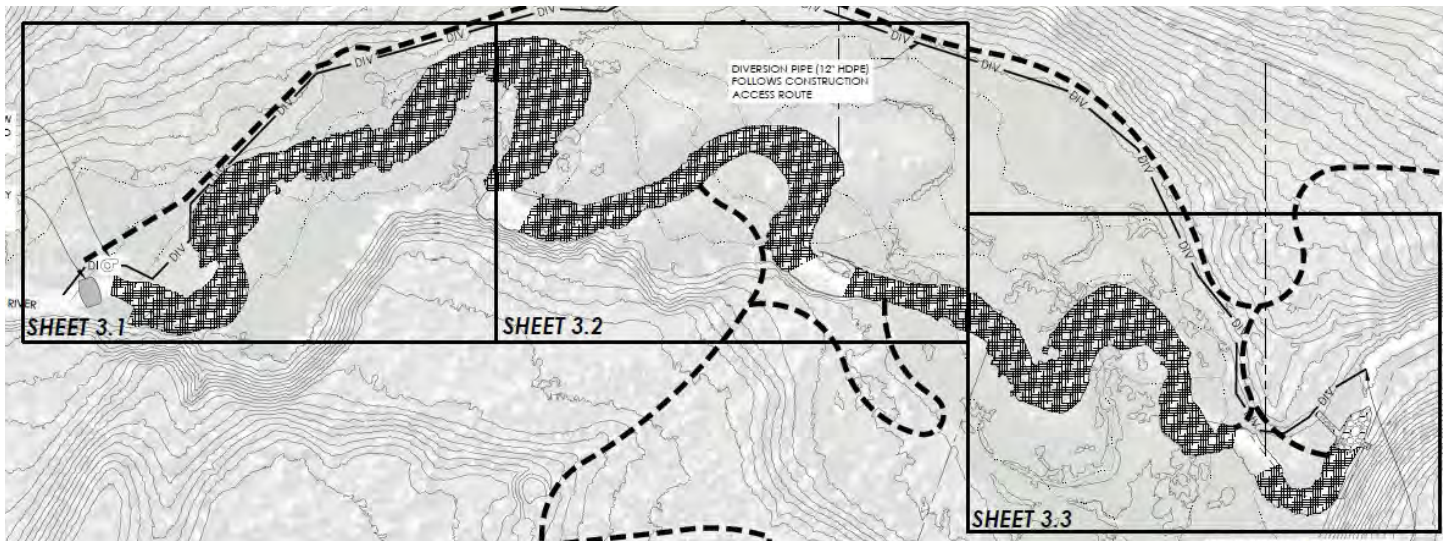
Final Restoration Plan for the Upper Meadow Site – Site 1
